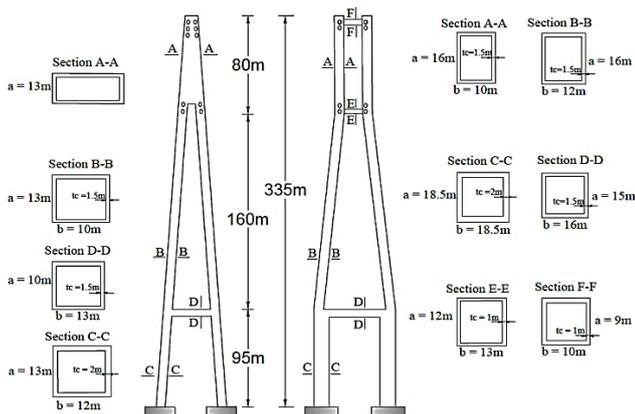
Dimensions of the A and H shape reinforced concrete pylons.
